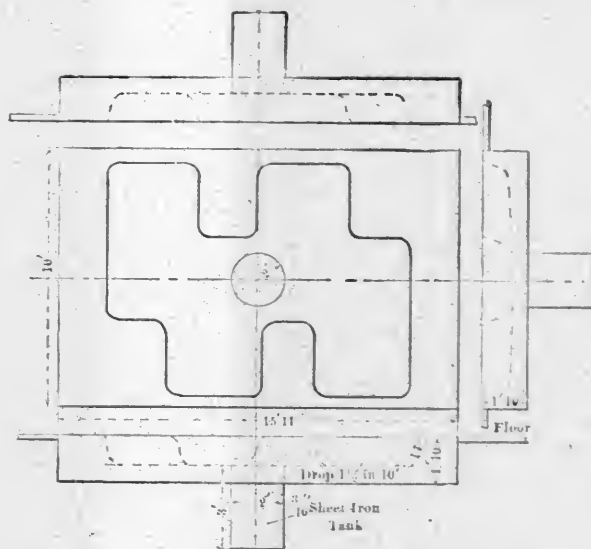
CONCRETE FOUNDATIONS FOR AXLE LATHES.
